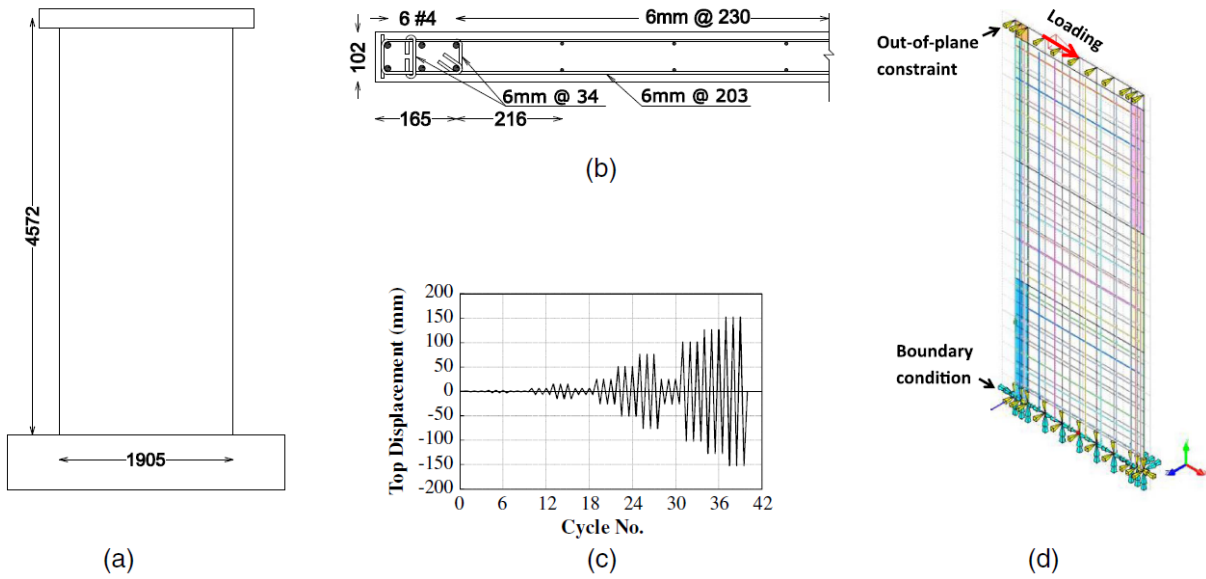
Specimen R2: (a) dimensions; (b) cross section; (c) loading history; (d) finite element model (all dimensions in mm)
